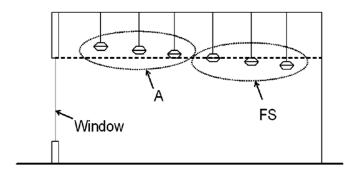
Figure A: Elevation view showing a nonresidential application of indoor lighting, labeled FS, that constitutes outdoor lighting for purposes of this article and indoor lighting, labeled A, which is installed so that it does not constitute outdoor lighting for purposes of this article.
